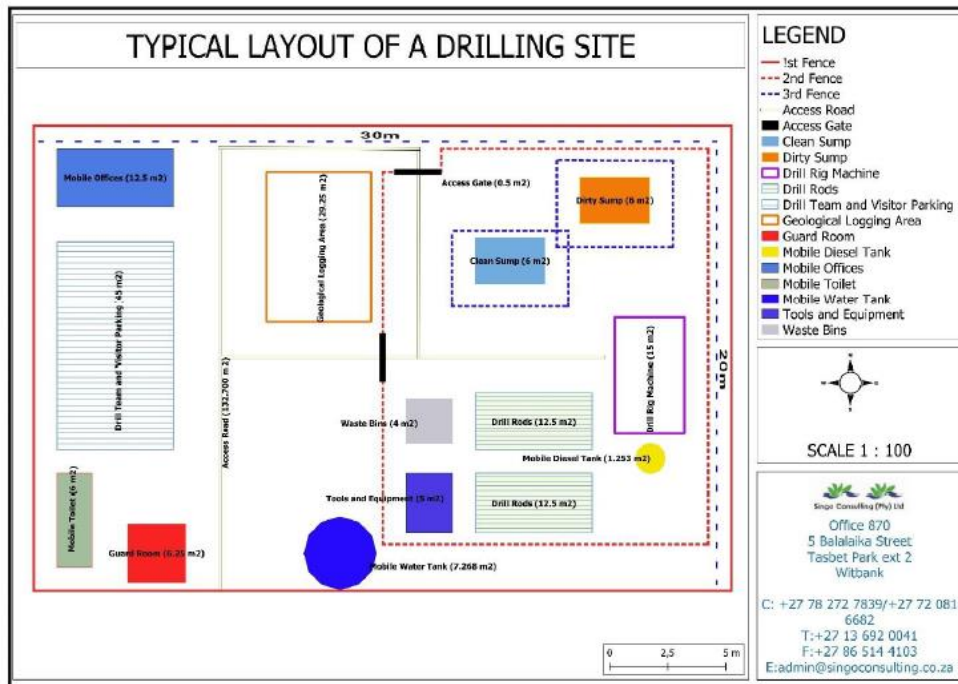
Typical layout plan of a drilling site (Singo Consulting (Pty) Ltd, 2023)
